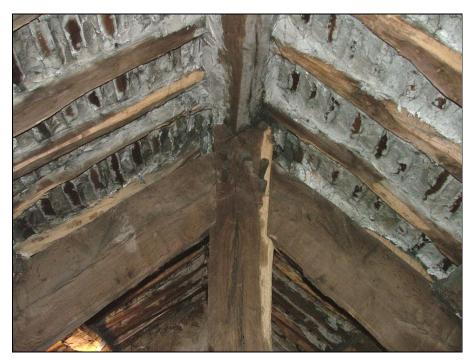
Detail of one of the king-posts showing wooden pegs and v-shaped notch in top of king-post to hold the ridge beam, attic of mansion house
